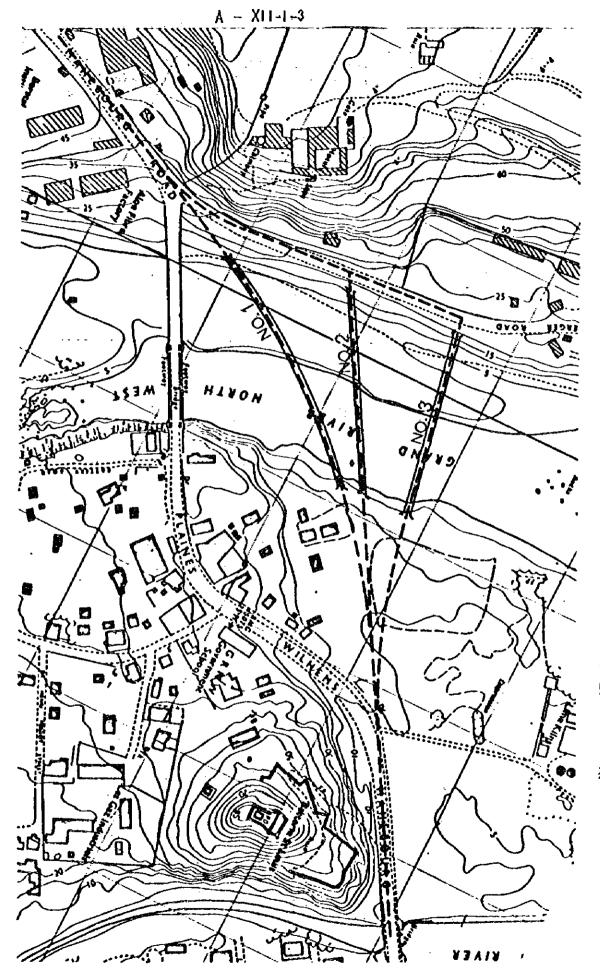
ALTERNATIVE LOCATIONS OF BRIDGE
